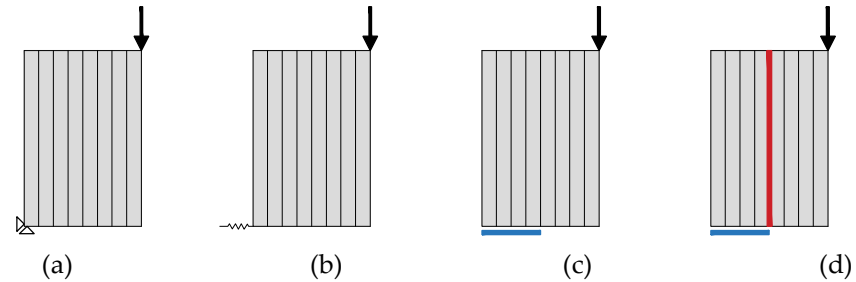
Configuration considered for the modified push-out numerical analysis: (a)-(c) smeared cracking approach with different constraints configuration between the specimen and the bottom steel plate, (d) discrete cracking approach.
